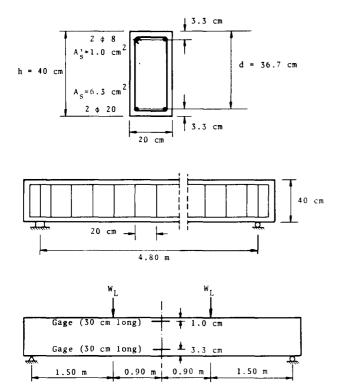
Beam 1 (nonprestressed, straight reinforcing steel)
